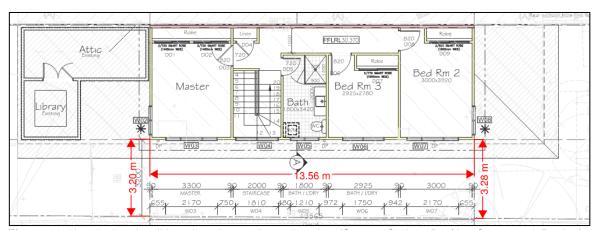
Unarticulated wall length to the southern elevation (*Source: Sydney Drafting Concepts & Design*). The minor variation to the wall length control is considered to remain consistent with the objectives of section 4 of RDCP, and acceptable on merit for the following reasons:
